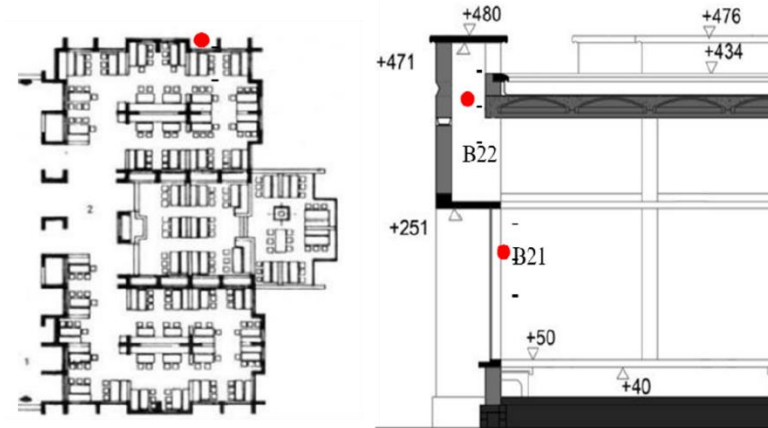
Solar Kitchen – floor plan and section through the exterior wall indicating the logger locations
